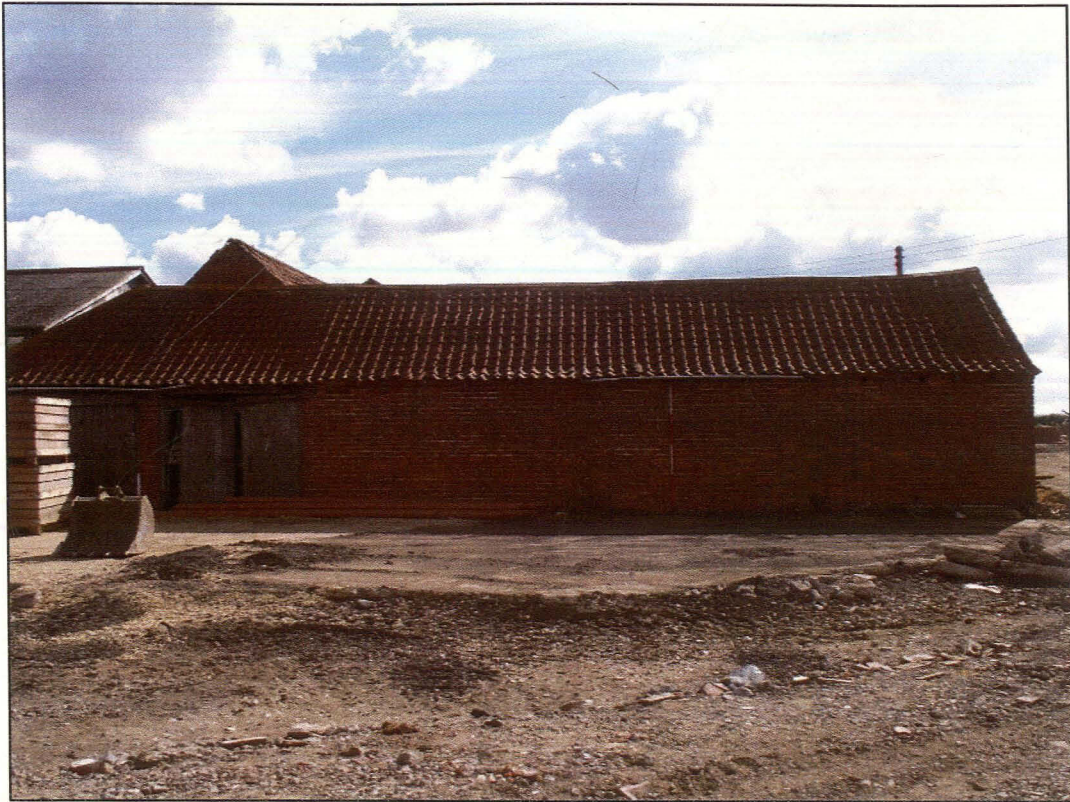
(Shot 9): West-south-west facing elevation of Block A, buildings A1 to A3, looking east-north-east
